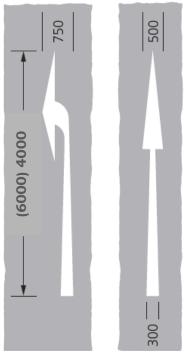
Standard dimensions of the turning and straight arrows road markings (after Department of Transport, 2009)
